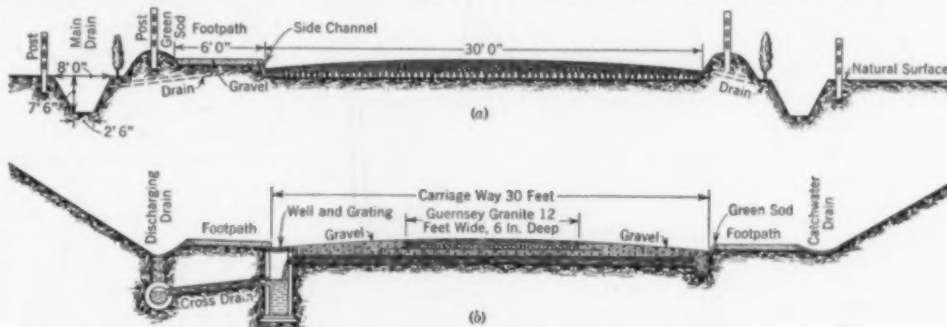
TYPICAL CROSS SECTIONS OF THE HOLYHEAD-SHREWSBURY ROAD
